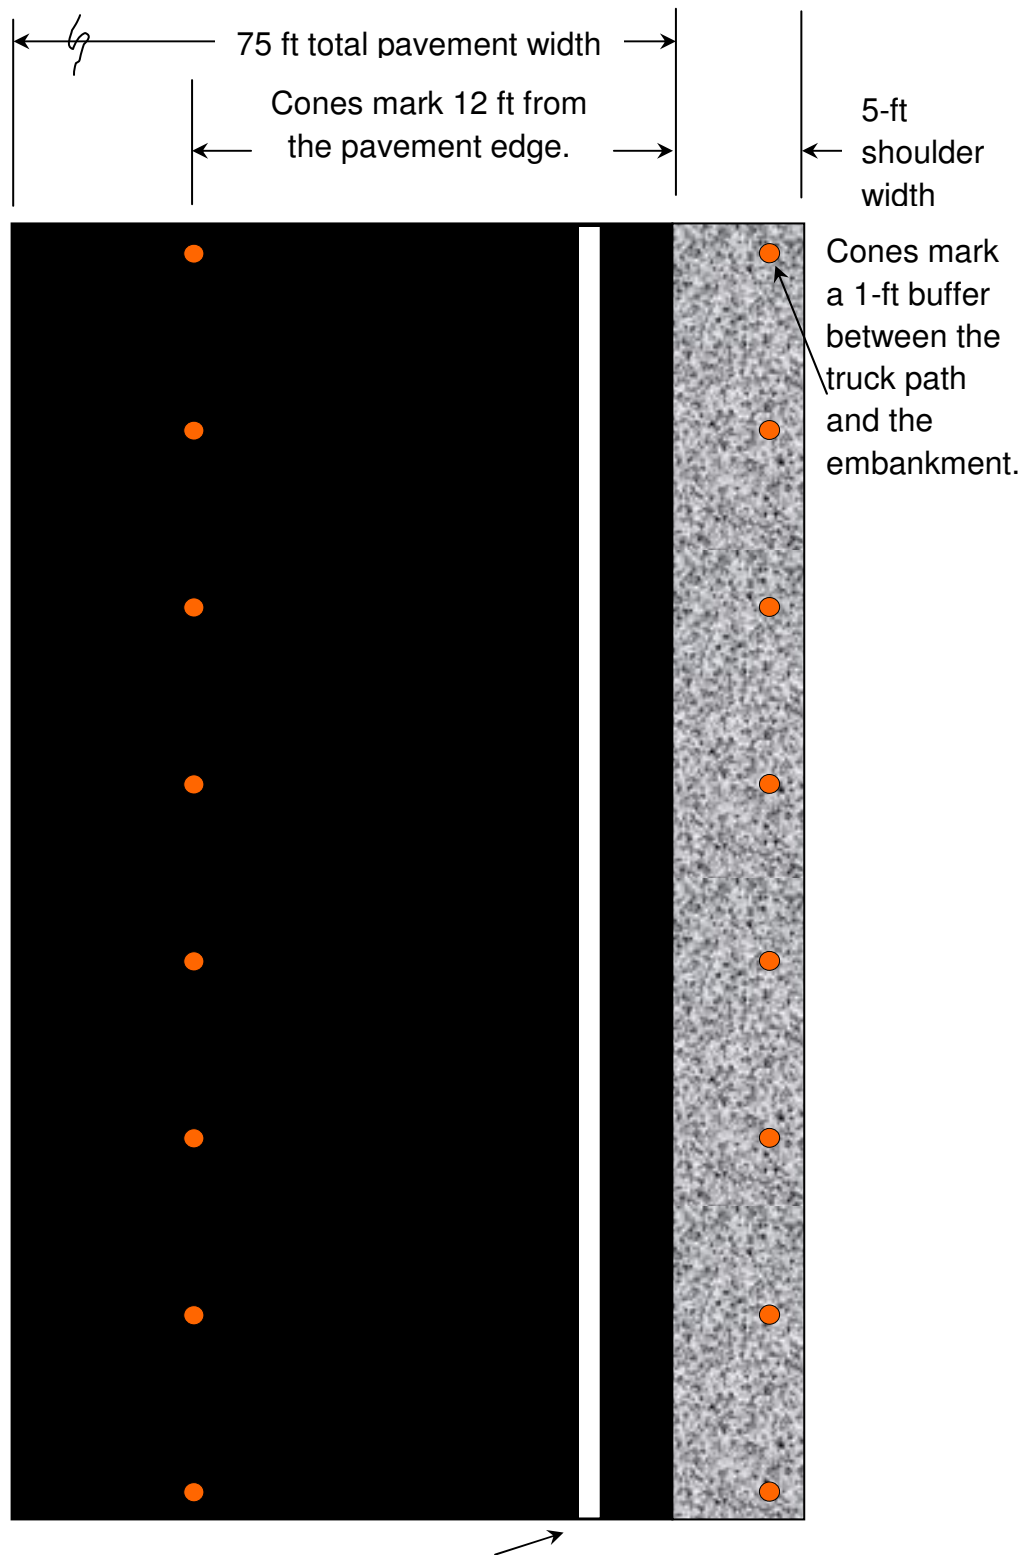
Illustration. Pavement, shoulder, and traffic cone layout.
